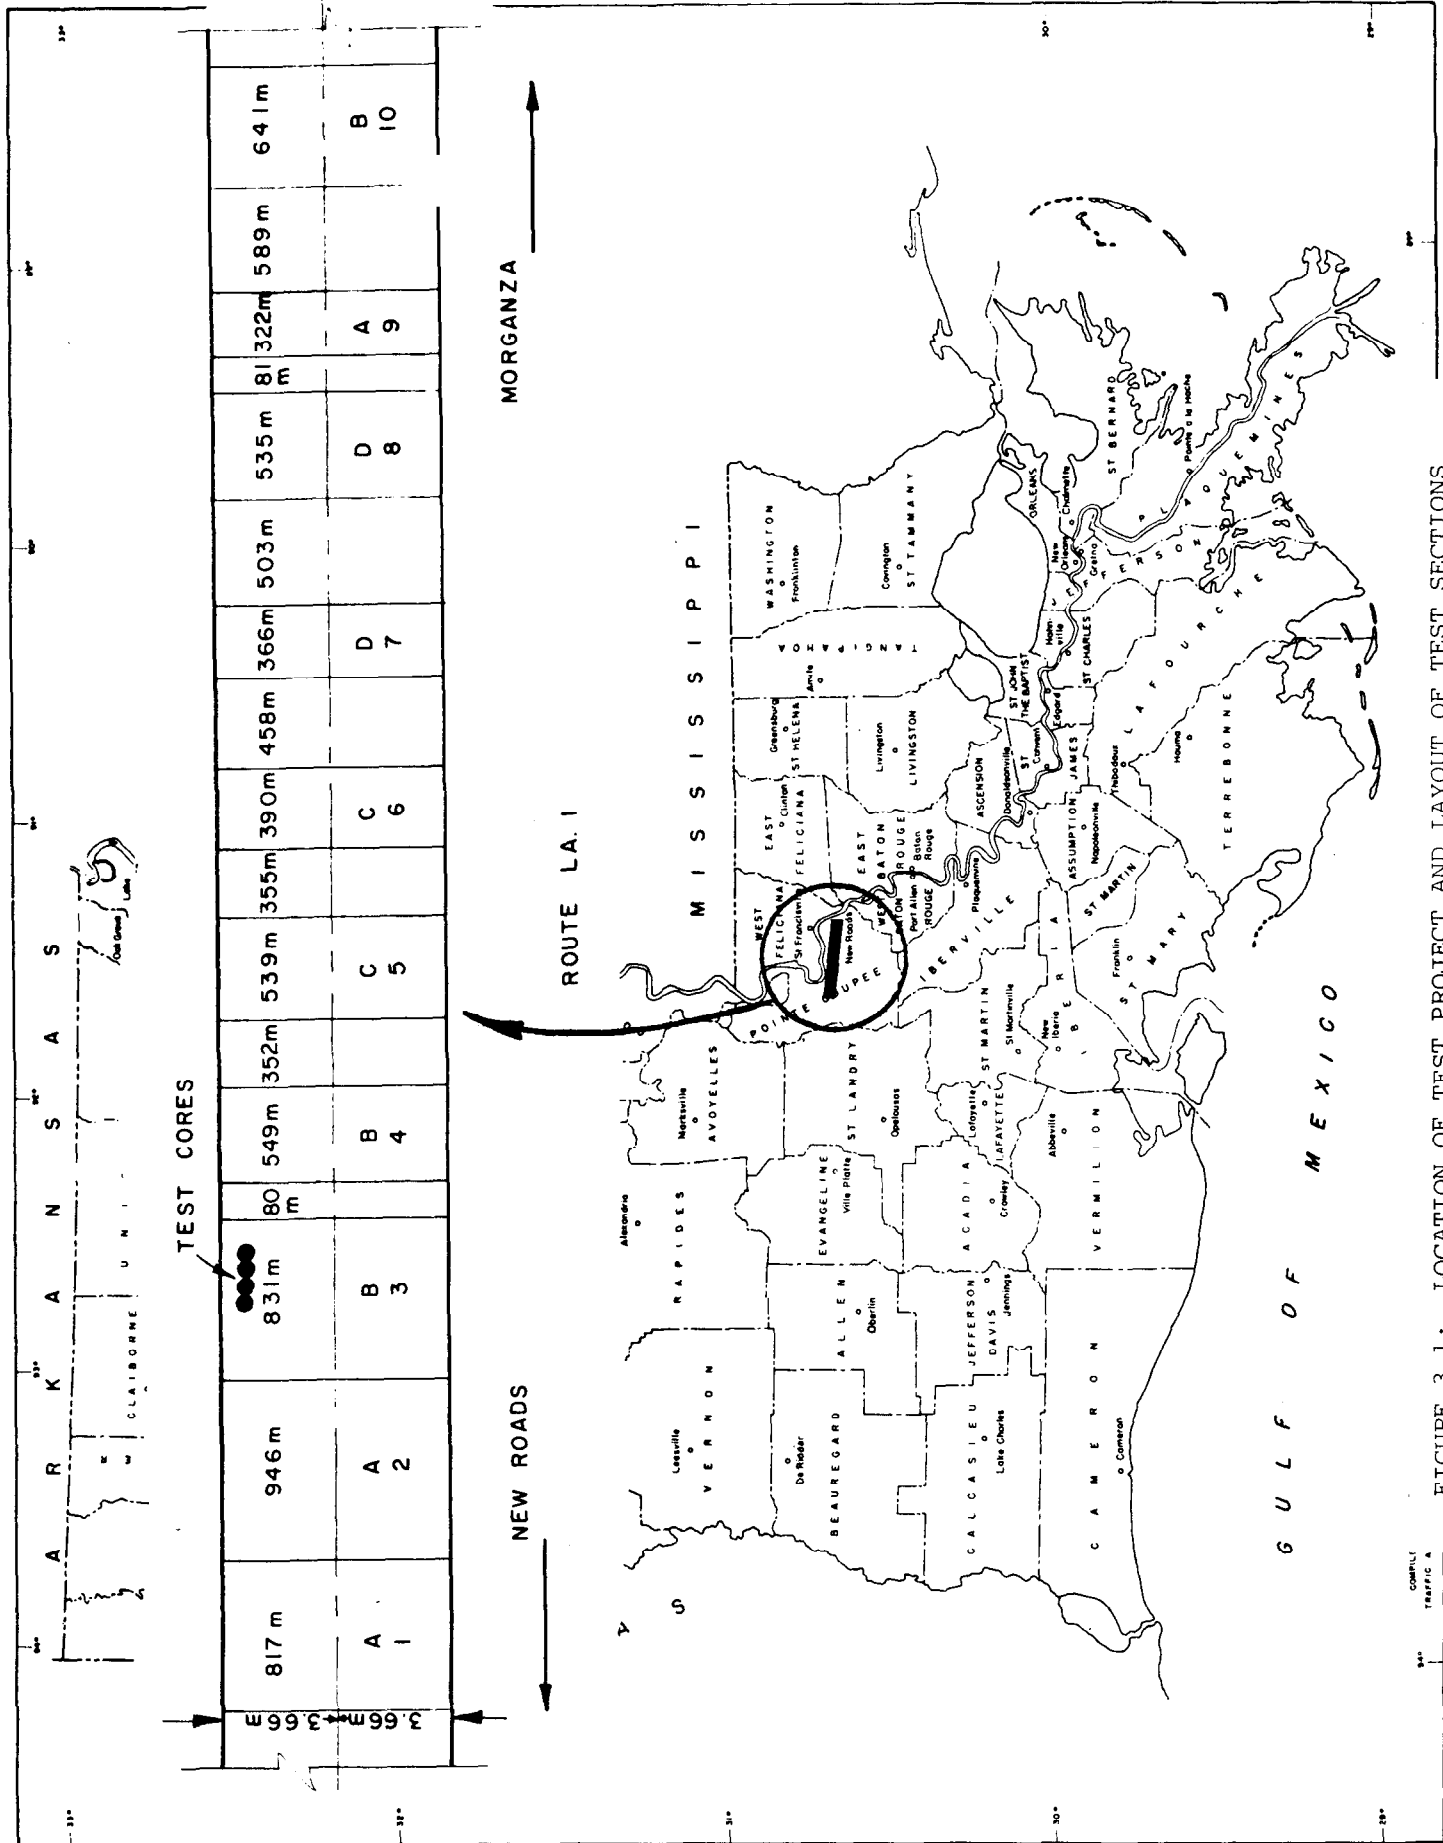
LOCATION OF TEST PROJECT AND LAYOUT OF TEST SECTIONS
